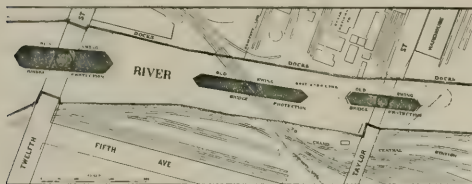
PIER OBSTRUCTIONS AT TAYLOR ST., CHICAGO.
